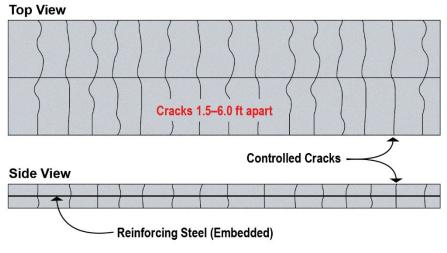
Continuously reinforced concrete pavement (CRCP)
